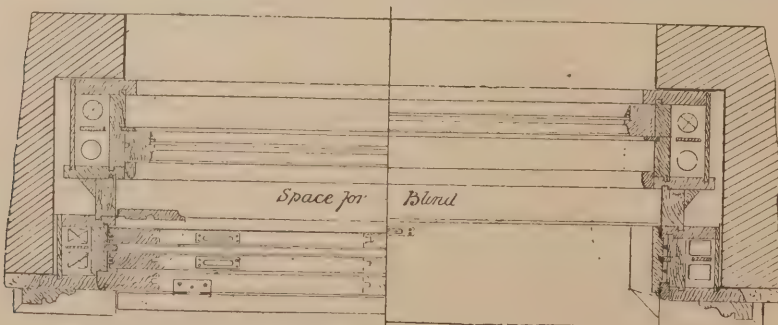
SECTIONAL PLAN OF SLIDING SHUTTERS.
